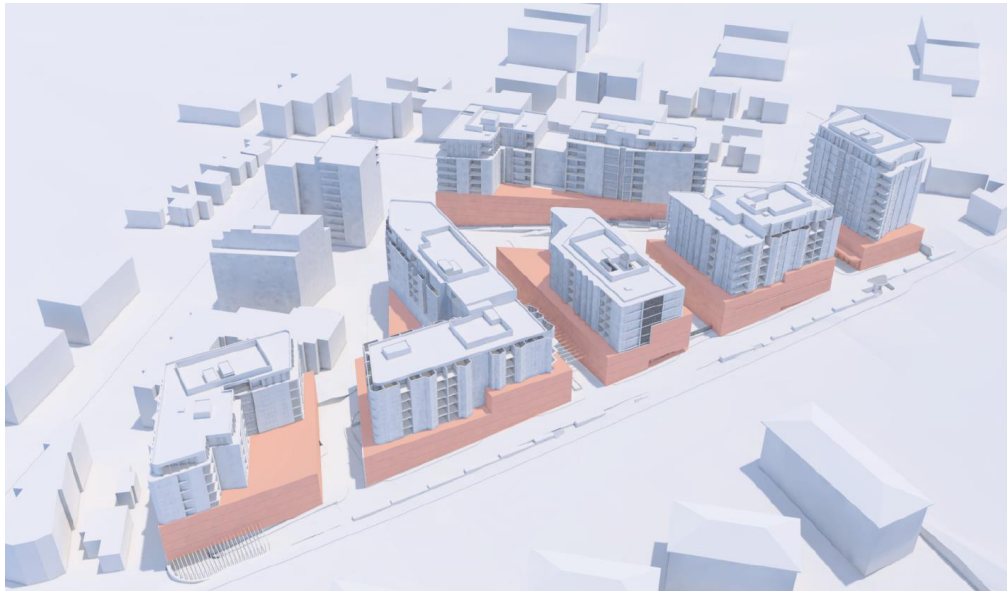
Potential relocation of floor area to ground floor plane and lower levels which would be inferior
